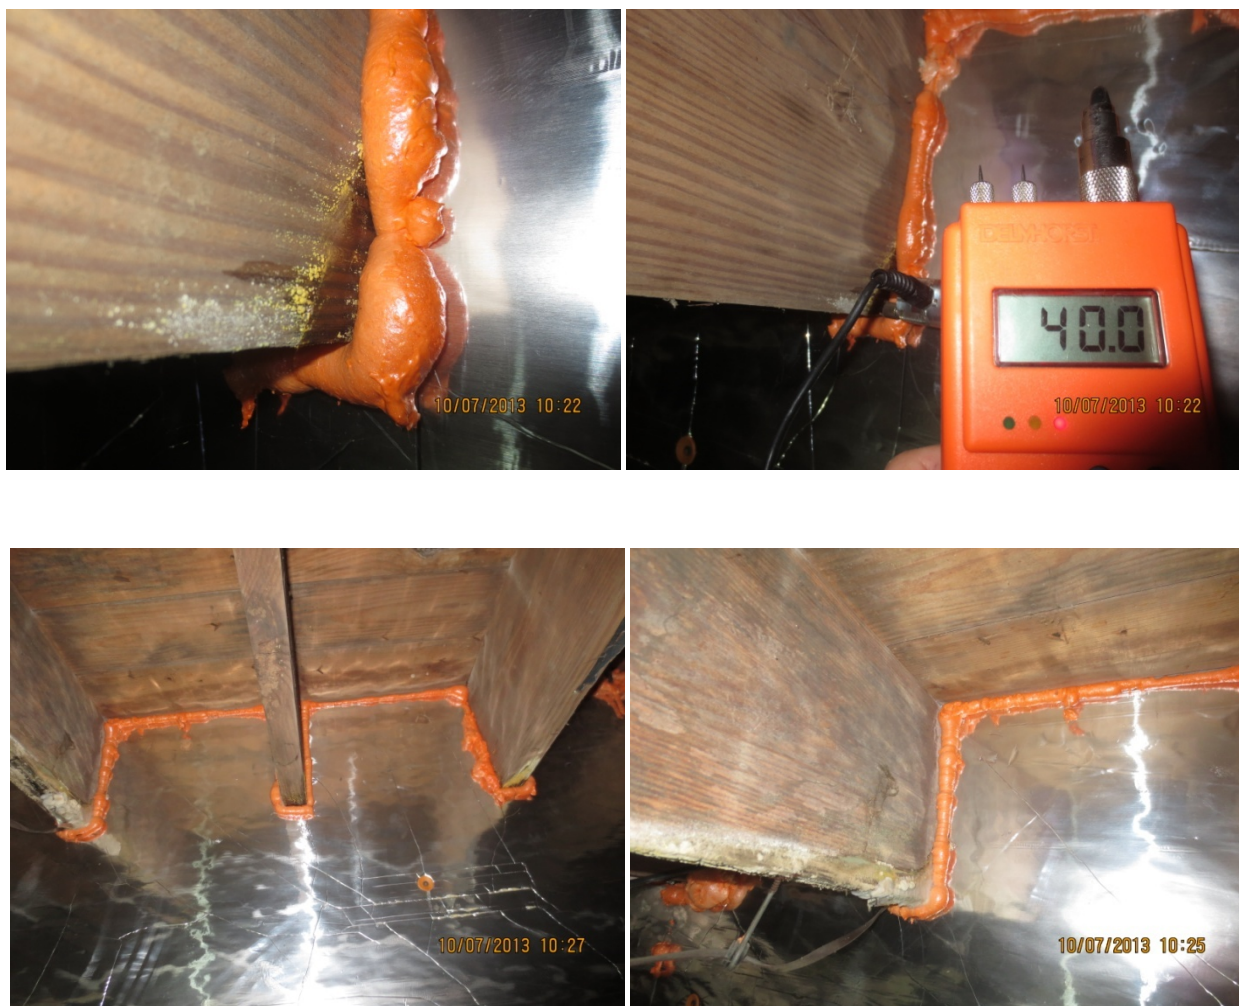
Wet floor joists coming out of insulated masonry wall, measuring 40% moisture content and showing fungi growth and decay
